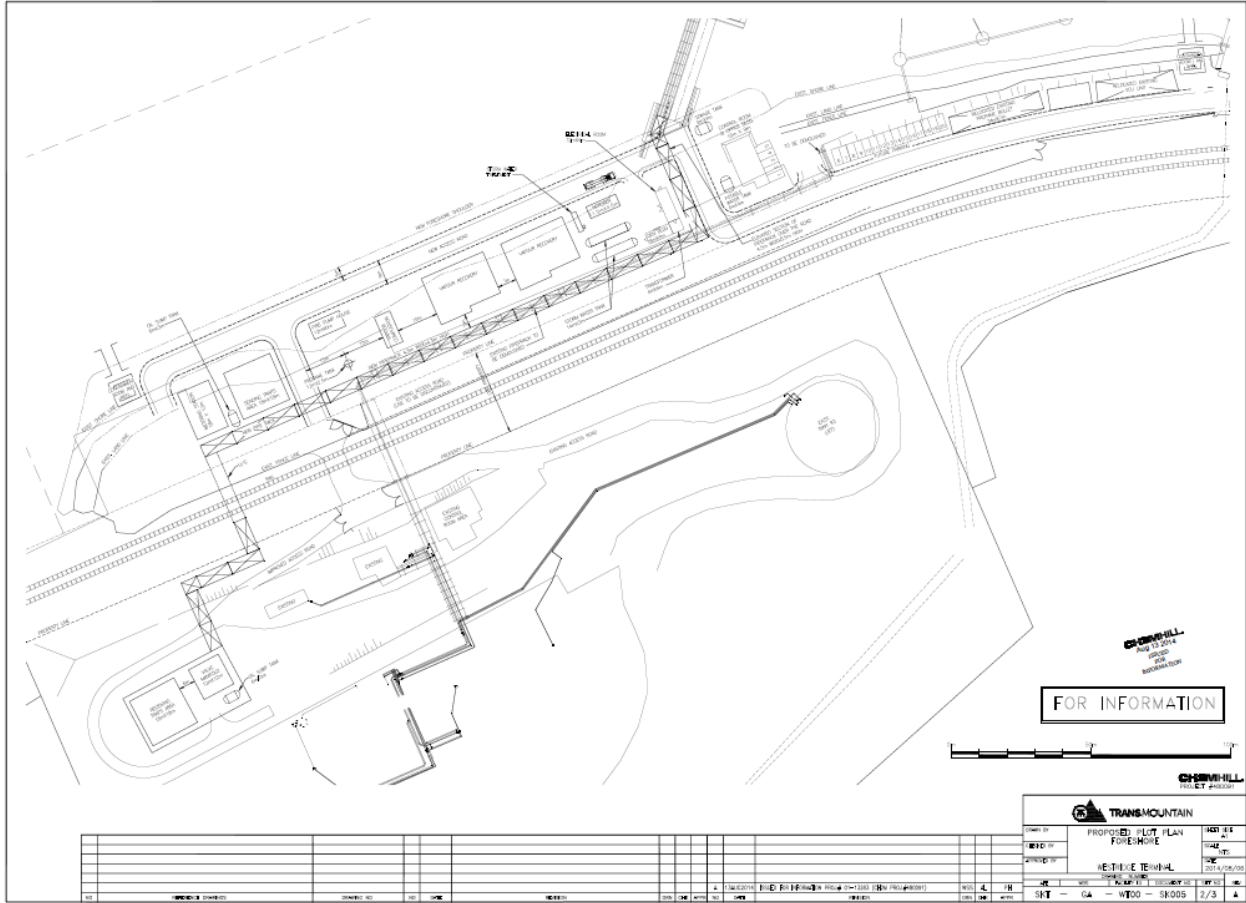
Westridge Terminal – Proposed Plot Plan, Foreshore
